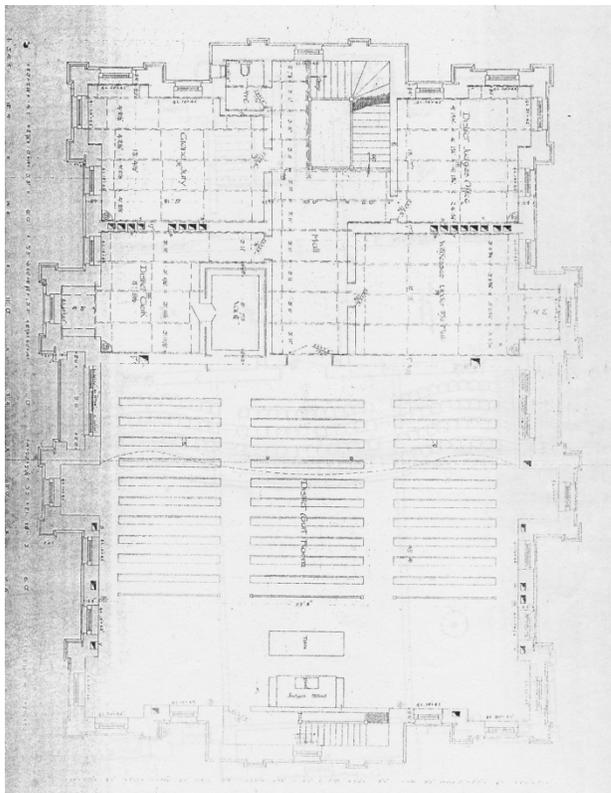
Caldwell courthouse plan, 1894 (Caldwell and Goliad courthouses were built from identical plans). Note ventilation shafts in walls, marked with shaded triangles.
